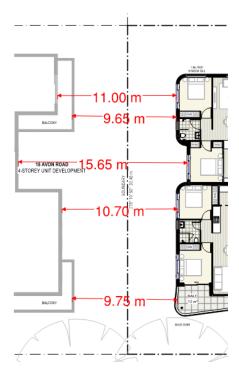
proposed building separation with the residential flat building to the south at 18 Avon Rd
